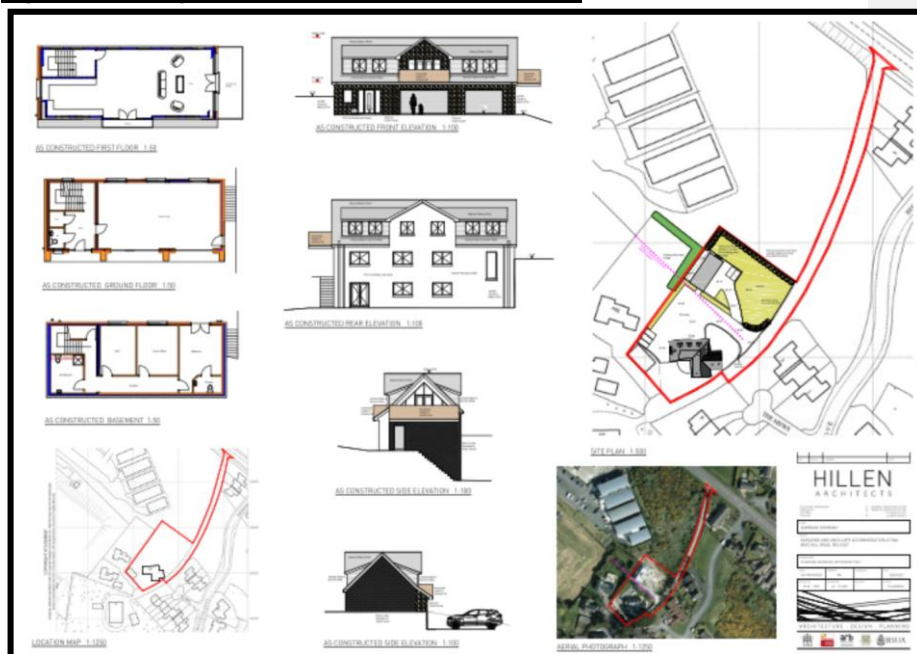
Elevations and floor plan - LA05/2018/0264/F
